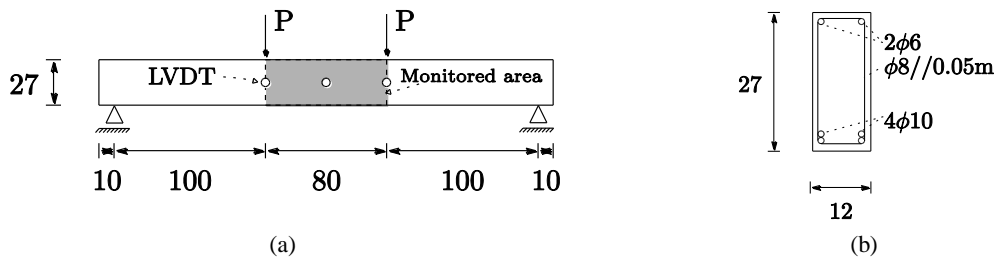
Lightweight high-strength concrete beam: (a) structural scheme, load and boundary conditions; and (b) cross-section (dimensions in cm)
